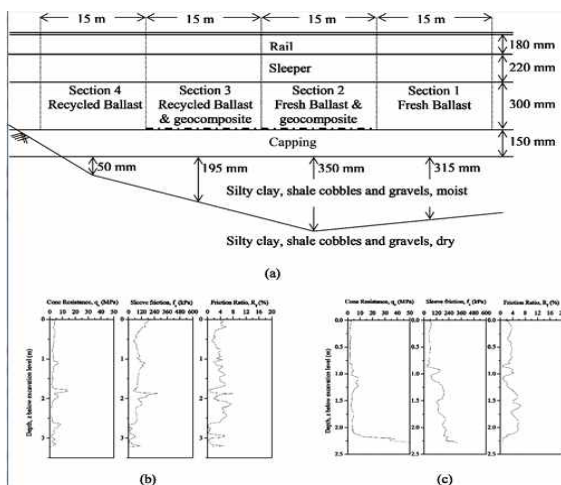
(a) Longitudinal section of instrumented track at Bulli (b) EFCP test record at center of Section 2 (c) EFCP test record at center of Section 4
